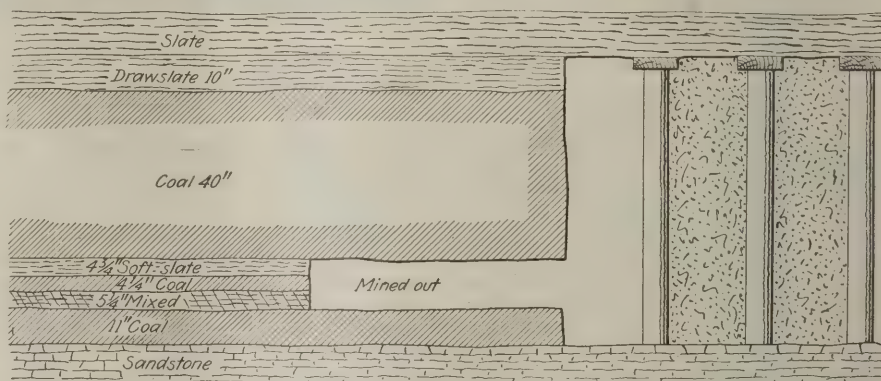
Rubbish in Seam Is Partly Cut Out and Partly Removed by Powder or Bar. Upper and Lower Benches Are Then Loaded
